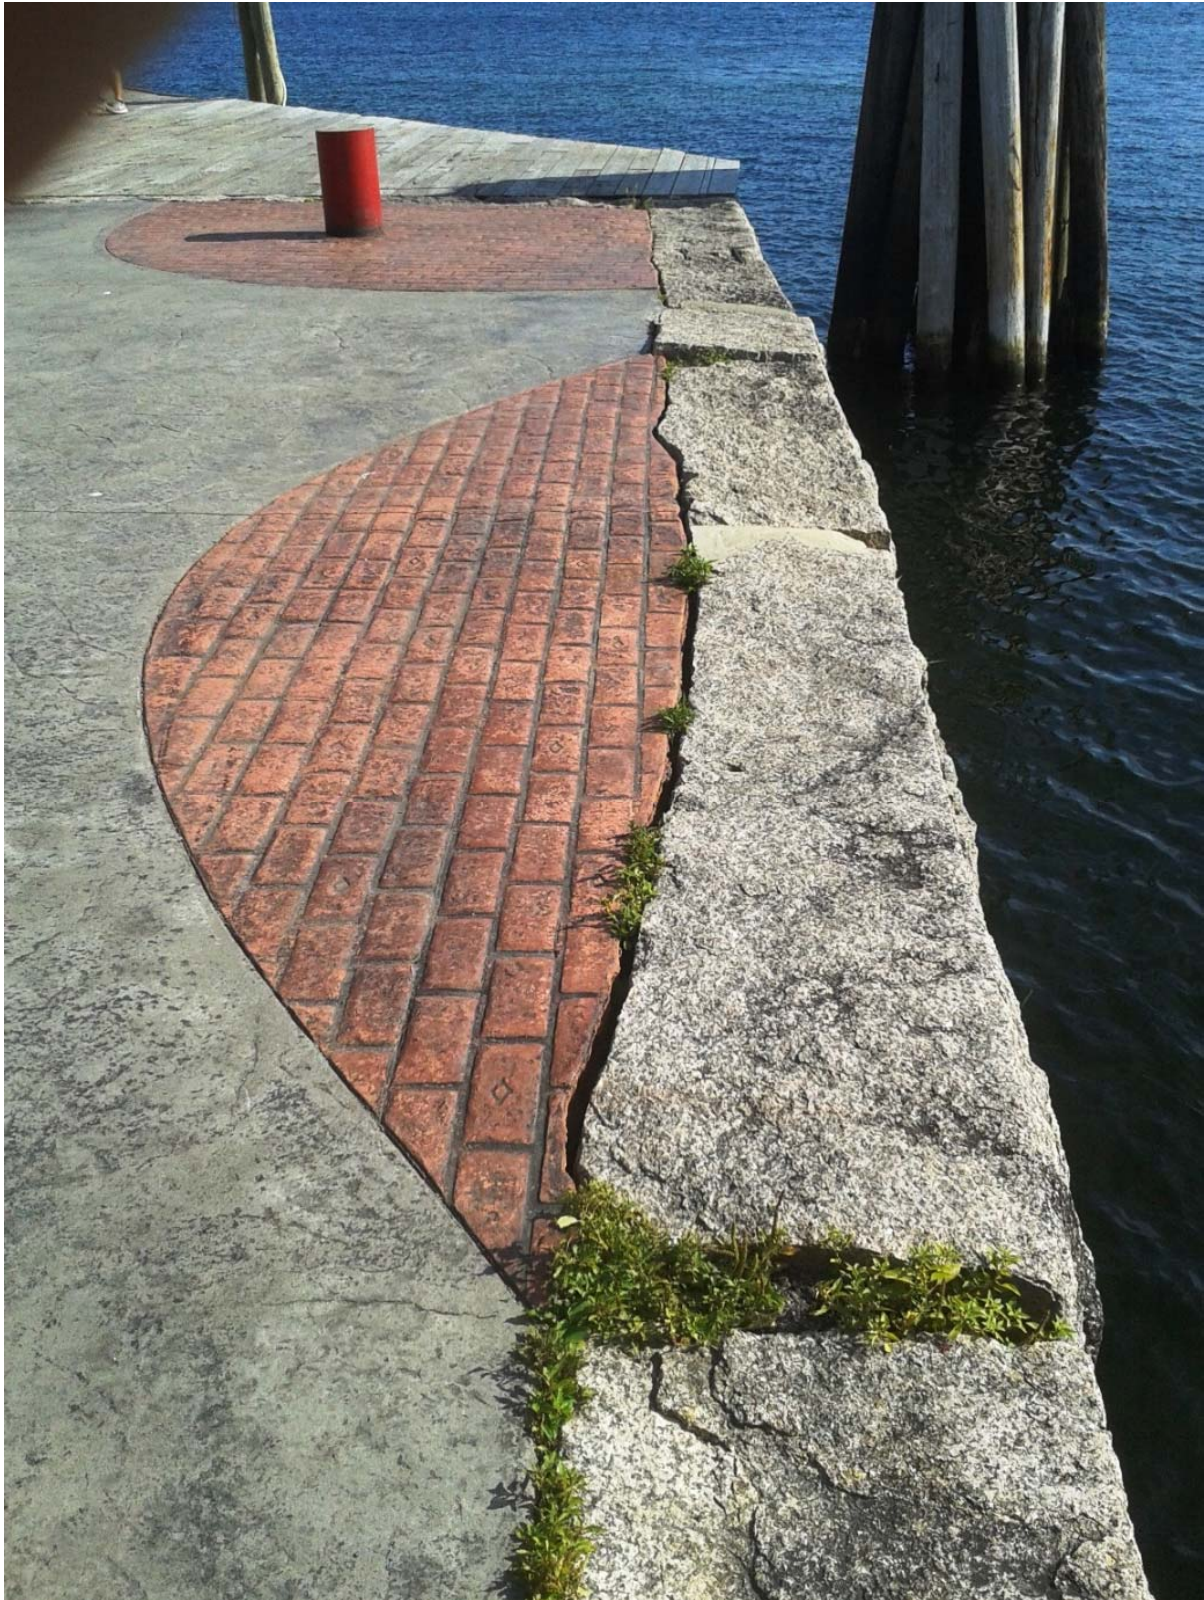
Western face of seawall, note opened gap between the granite blocks and cast in place concrete slab
